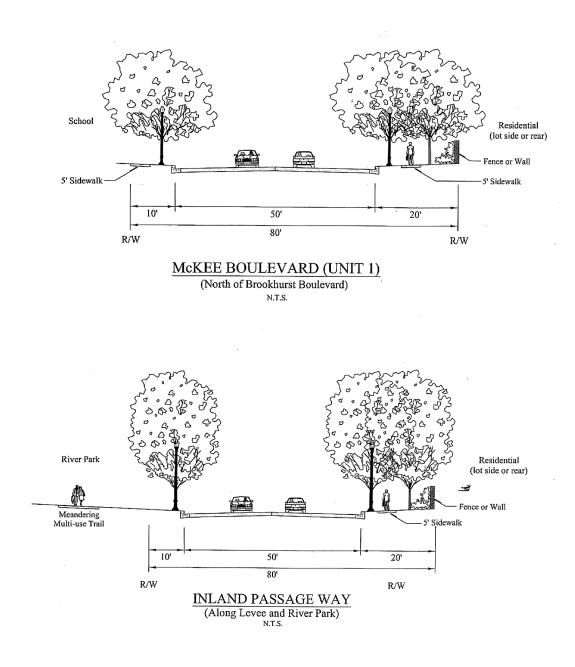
Street Sections - McKee Blvd. (Unit 1) and Inland Passage Way
